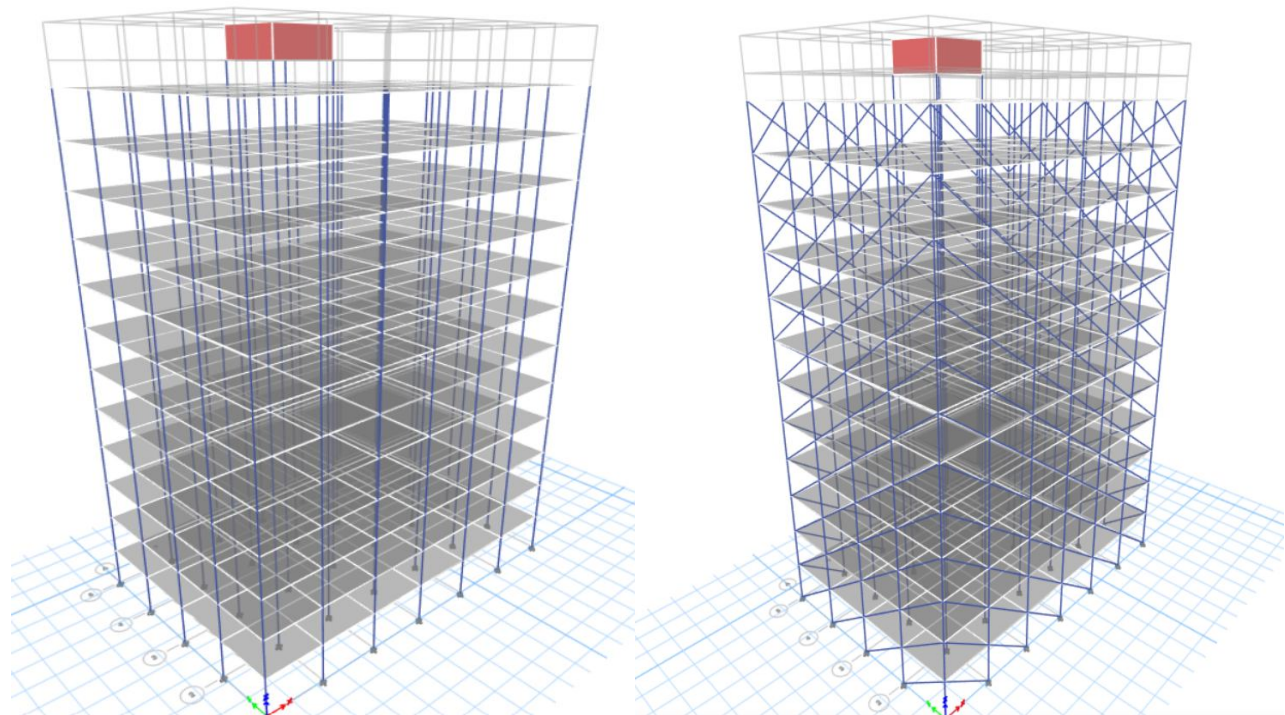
12 storey building considering water tank at top and without strut (BWS) Fig. 3 12 storey building considering water tank at top and without strut (BS)
